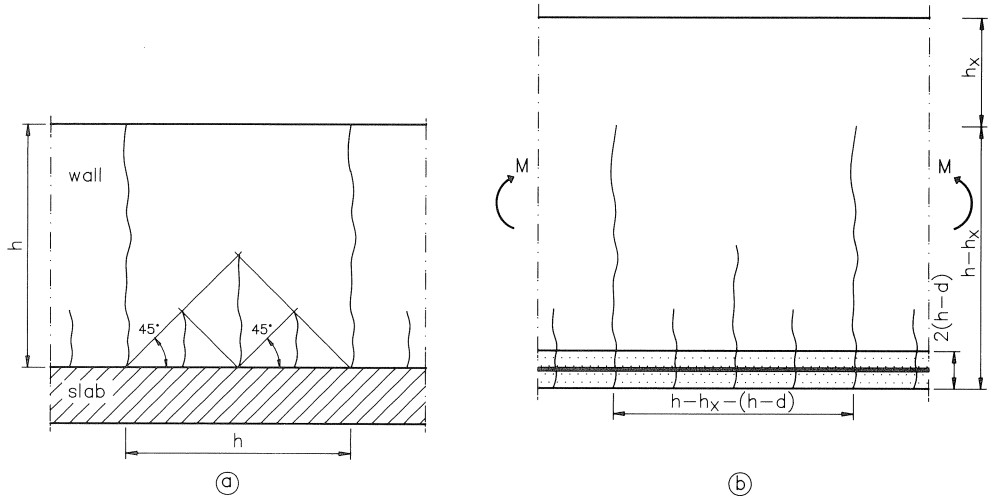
The crack pattern of an unreinforced wall cast on a hardened slab [CUR, 1978] (a) and the corresponding model of a deep beam without web reinforcement (b).
